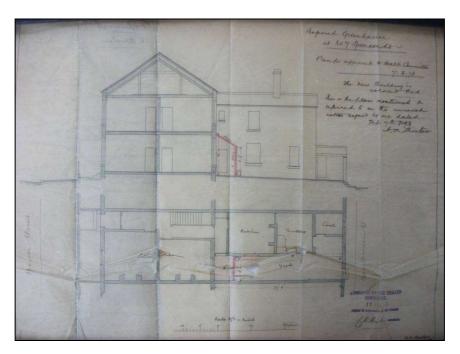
Building Control Plan for Proposed Greenhouse at 7 Spencer Street dated 17 Feb 1893 (CAC Ref: CAE4/12/124)
